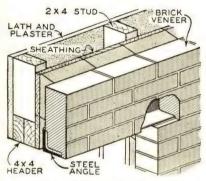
Steel Angle Used as Lintel in Brick Veneer Wall Eight Inches in Thickness
